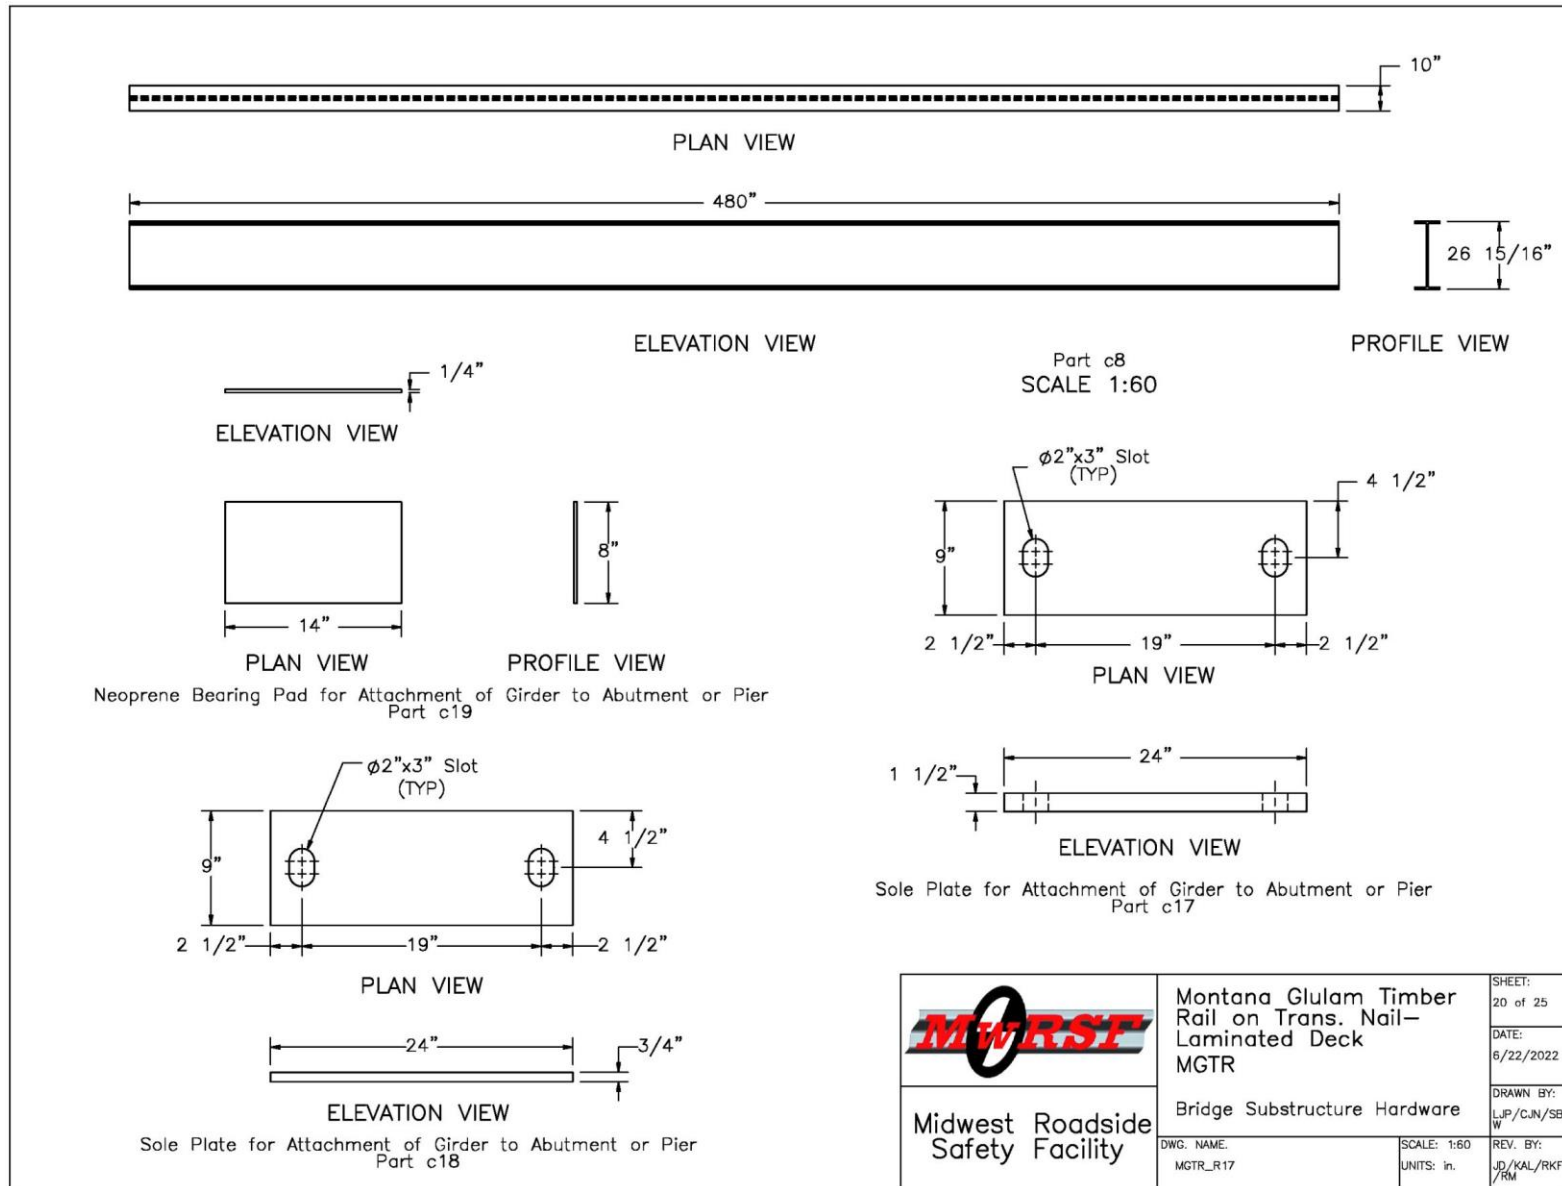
Bridge Substructure Hardware, Test Nos. MGTR-1S and MGTR-1D
